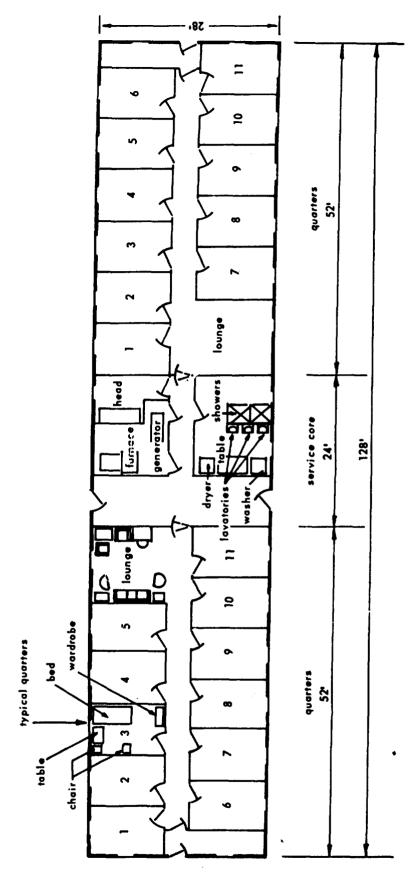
Floor plan of duplex arrangement providing two quarters units and a service core for a temporary polar camp.
